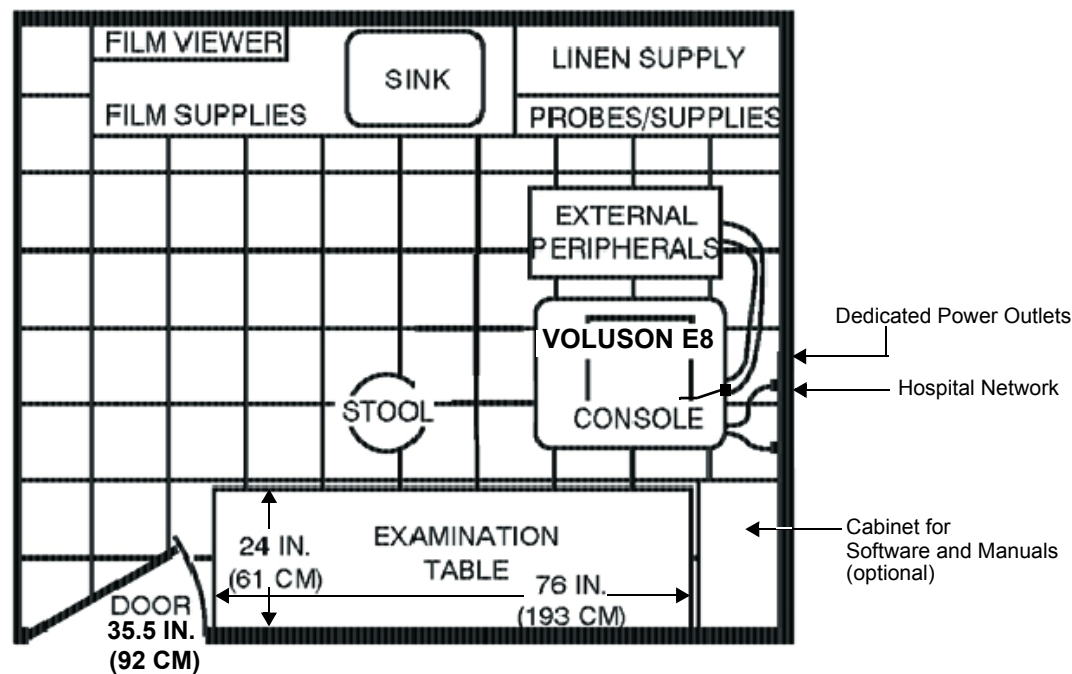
Recommended Floor Plan 4.3m x 5.2m (14ft x 17ft)
